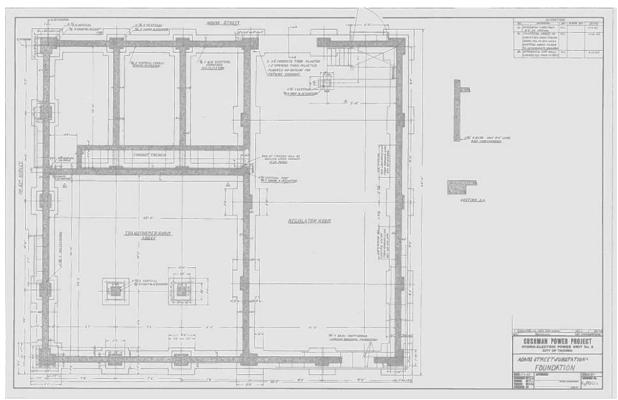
Adams St. Substation, foundation plan, 1925. Courtesy of Tacoma Power.
